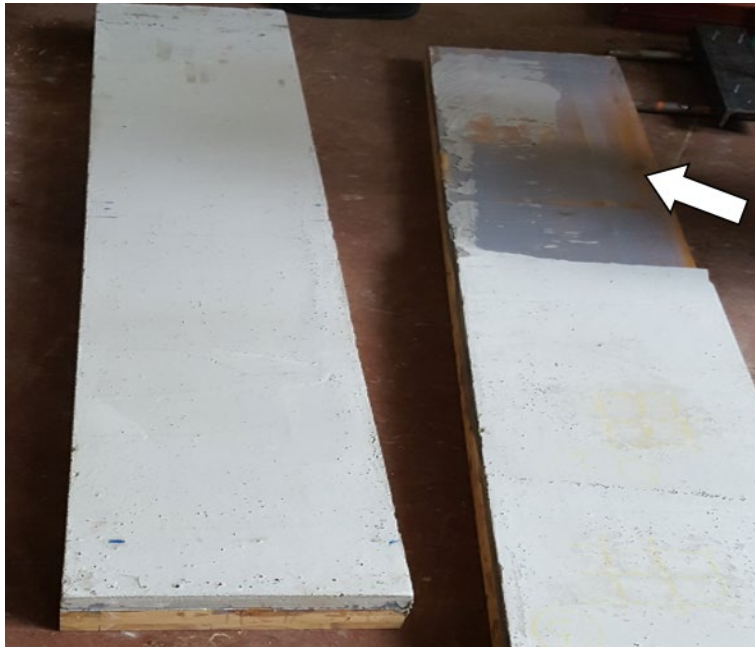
View of the timber-concrete composite specimen after the collapse.
